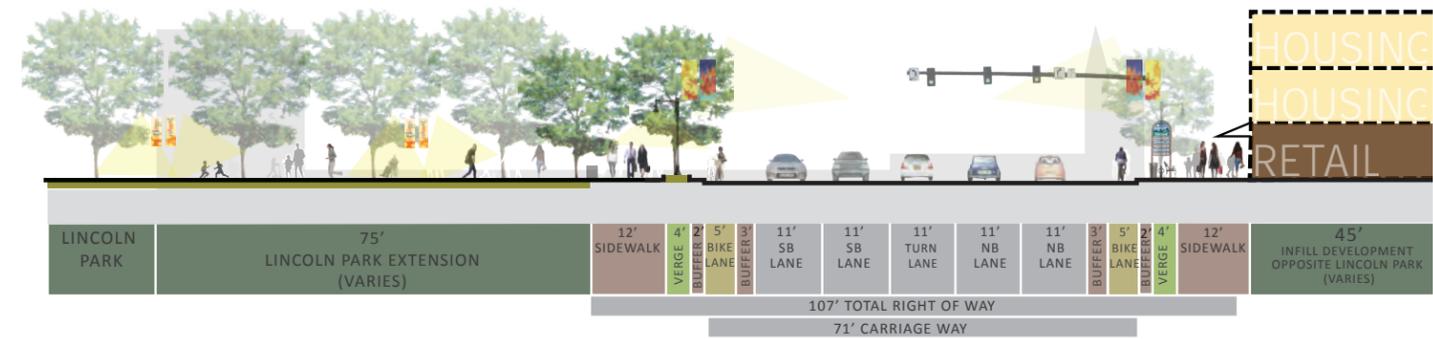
Section CC' Through Franklin Street Near Lincoln Park Looking North
